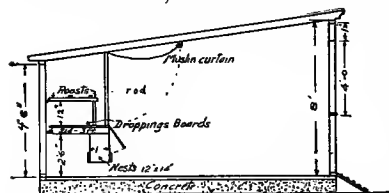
Cross section of poultry house; note arrangement of roosts and nests which leaves all floor space open.
